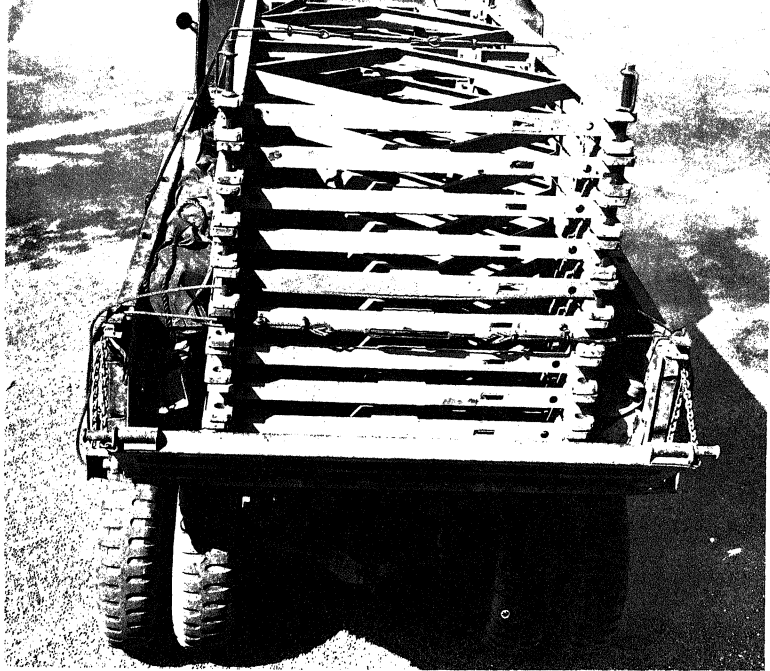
Truck load No. 3—Panel load on 5-ton truck.
